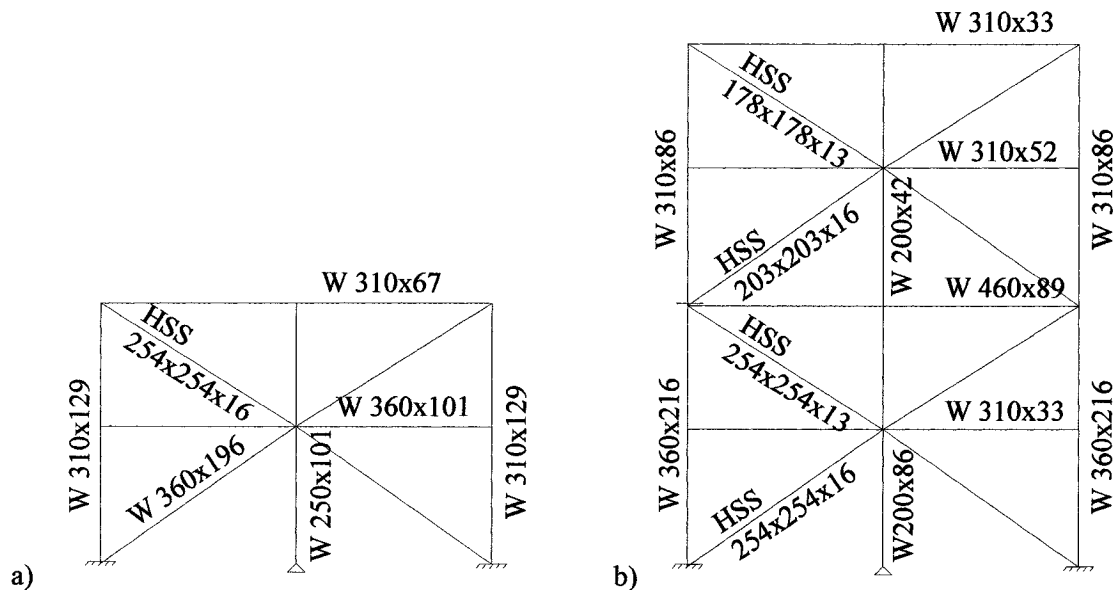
Brace, beam and column sections for the studied buildings
